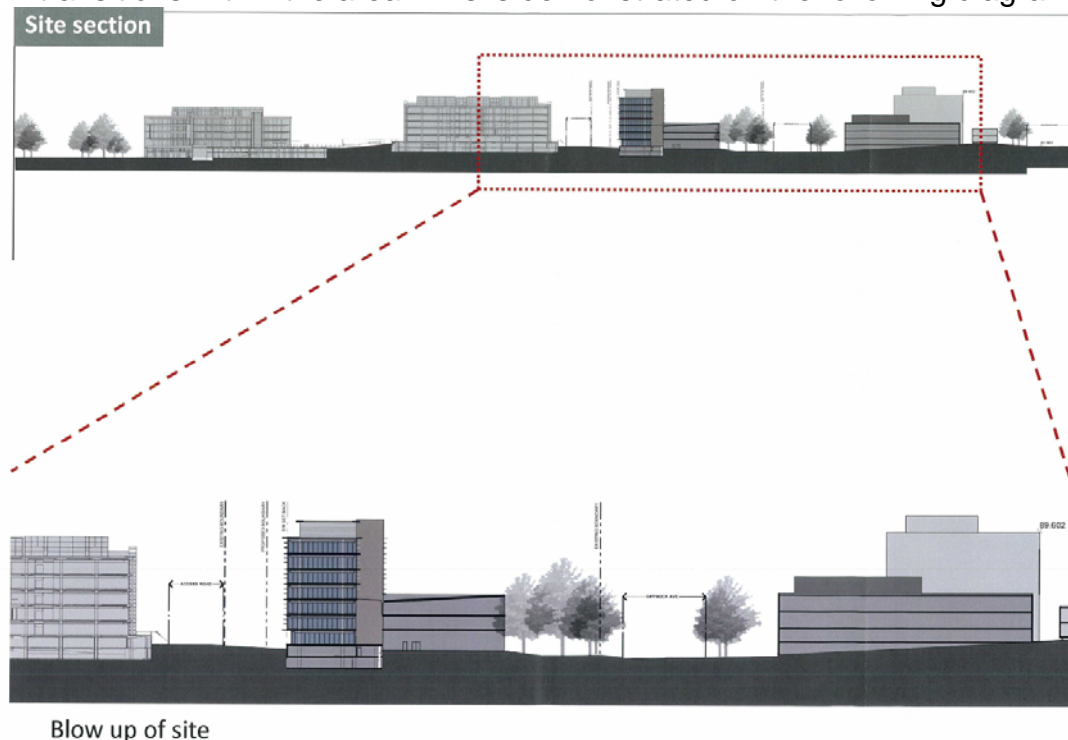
The above section demonstrates the height of adjoining buildings and the proposed building.
